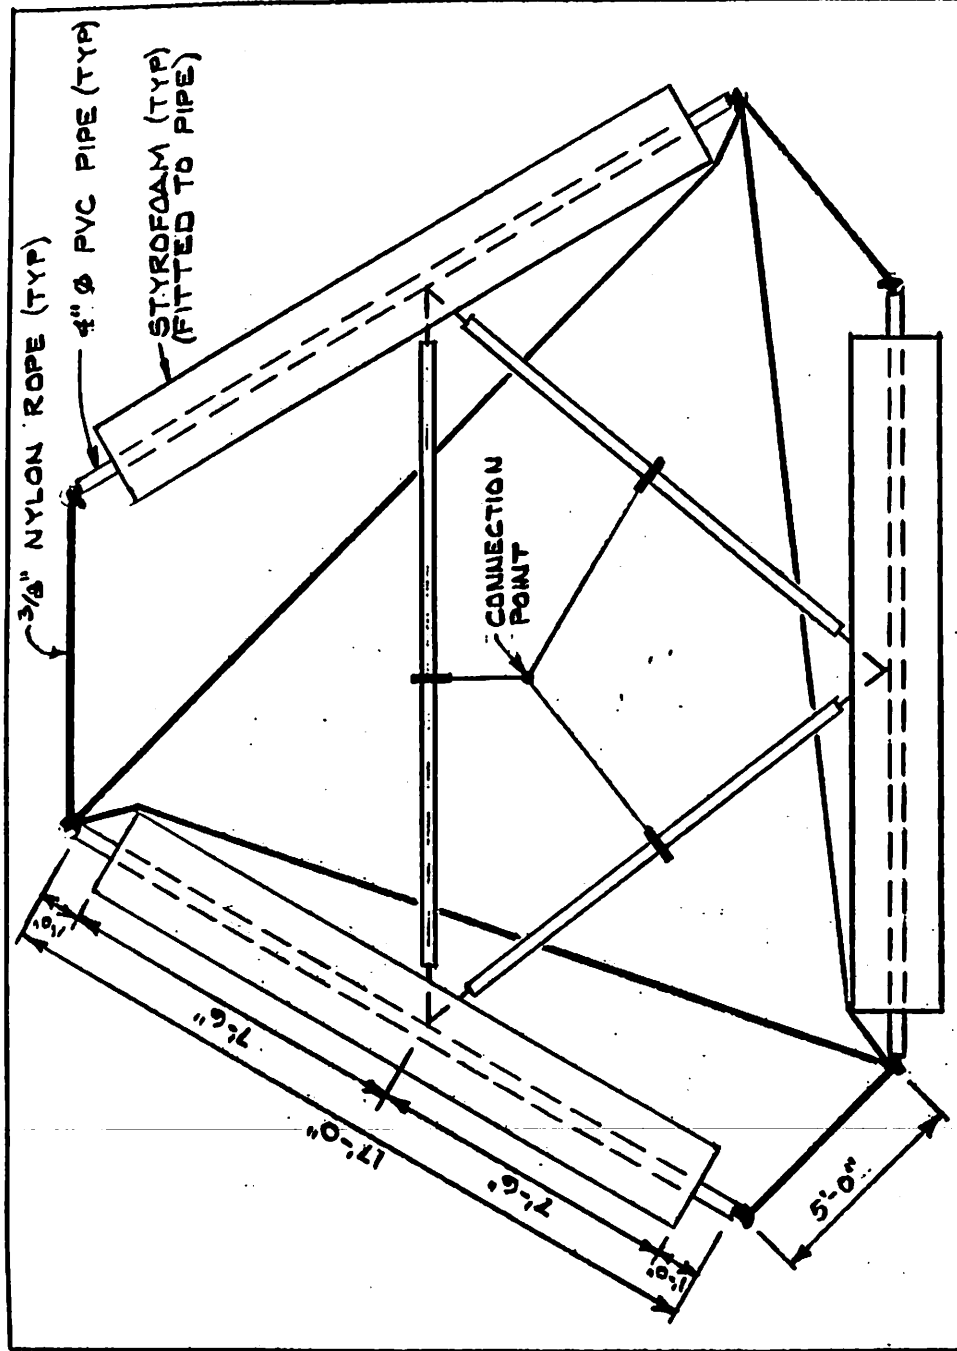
PLAN - PROPOSED LAYOUT FOR
